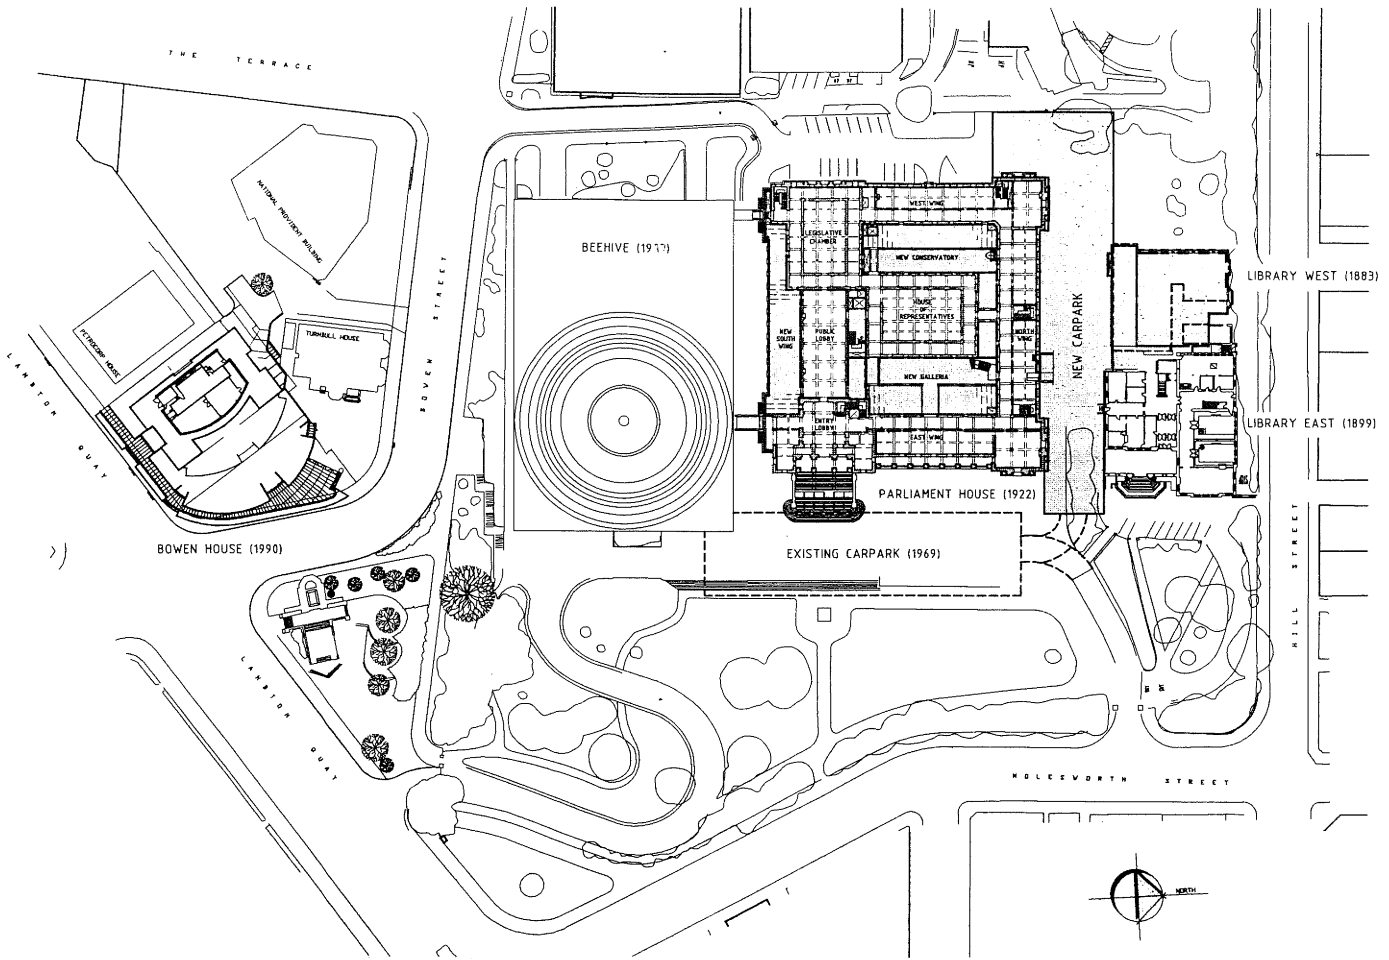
Site Plan of Parliament House, Wellington, New Zealand.
